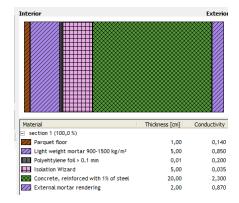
Floor made of concrete in 1980, construction detailed by LESOSAI.
